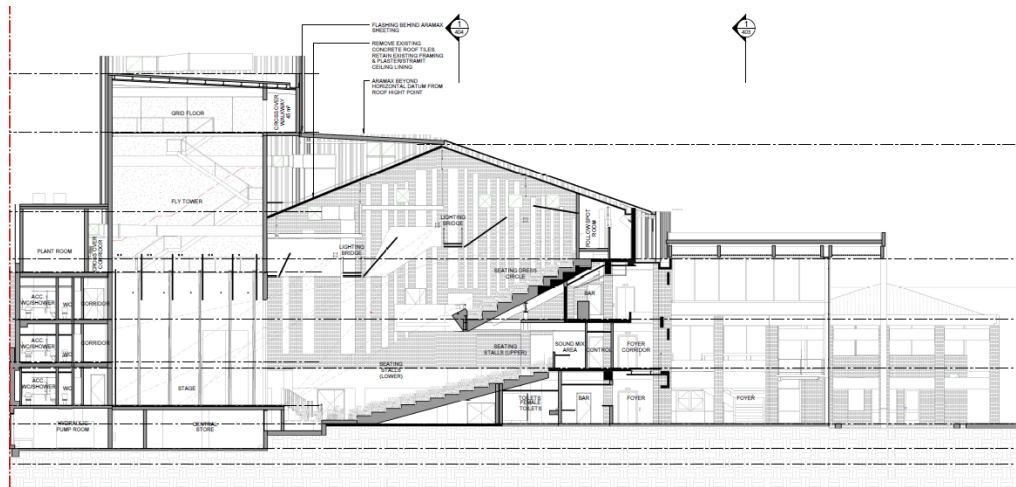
Proposed section through the auditorium and new fly tower. (Source: NBRSArchitecture and CHROFI)
